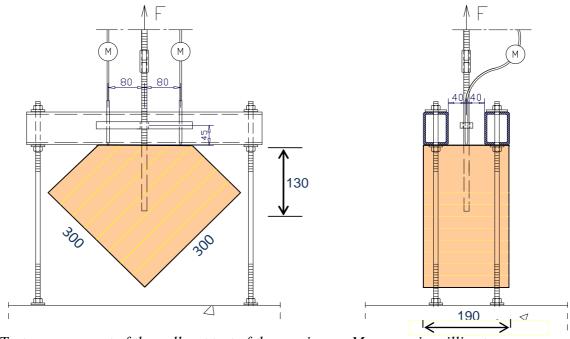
Test arrangement of the pull-out test of the specimens. Measures in millimeters.
